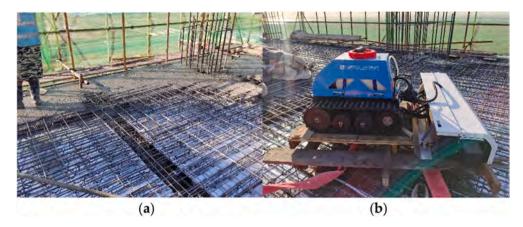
Field test of concrete curing robot: (a) Engineering appearance of concrete curing site; (b) Concrete curing robot body.
